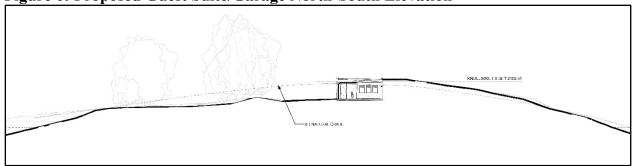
Proposed Guest Suite/Garage North-South Elevation
